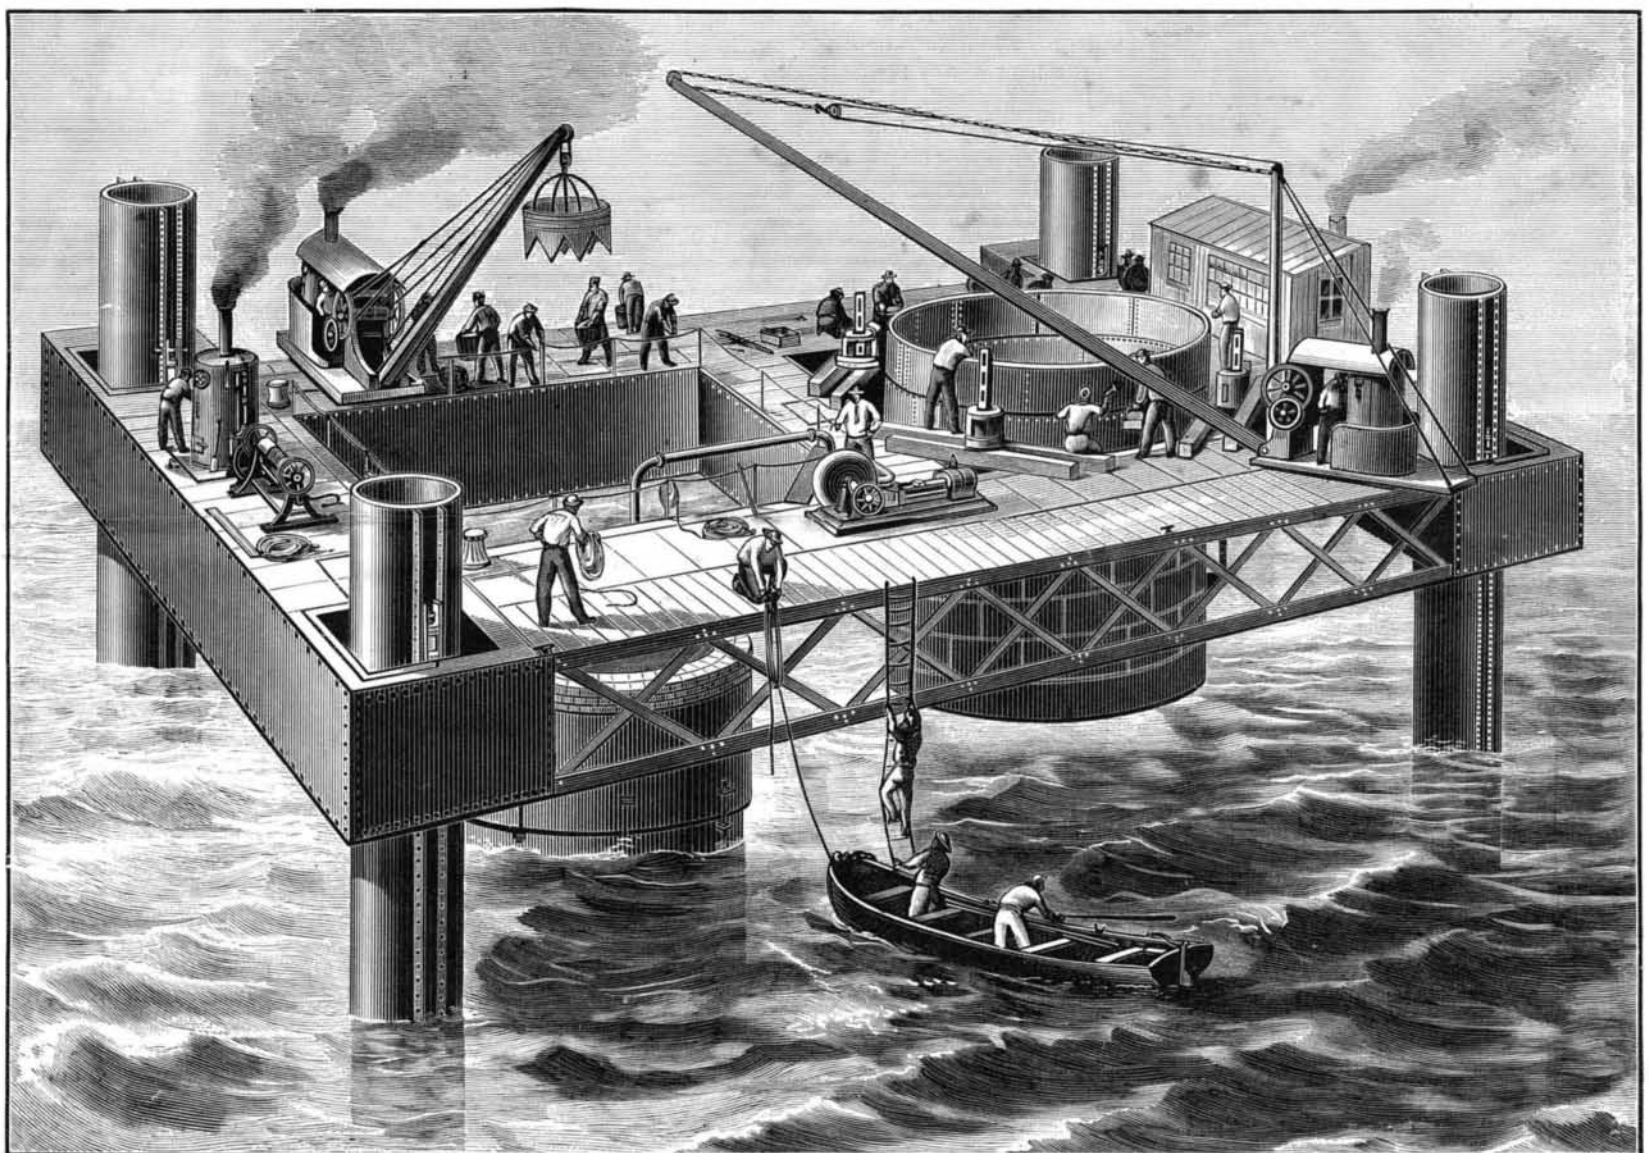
CONSTRUCTION OF PIERS OF THE NEW TAY VIADUCT.
